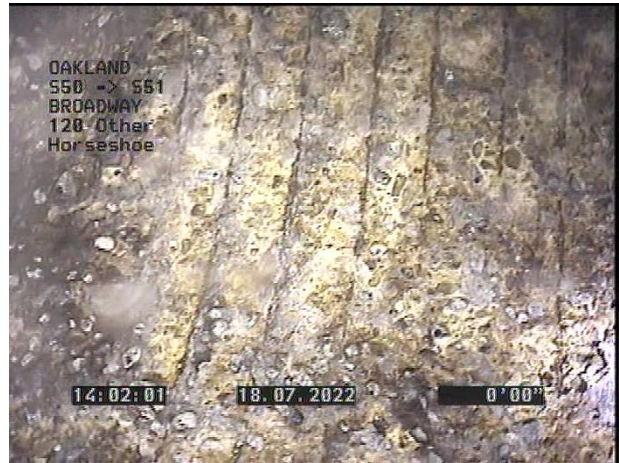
Exposed and corroded reinforcing steel from 0 - 5 feet downstream of S50
